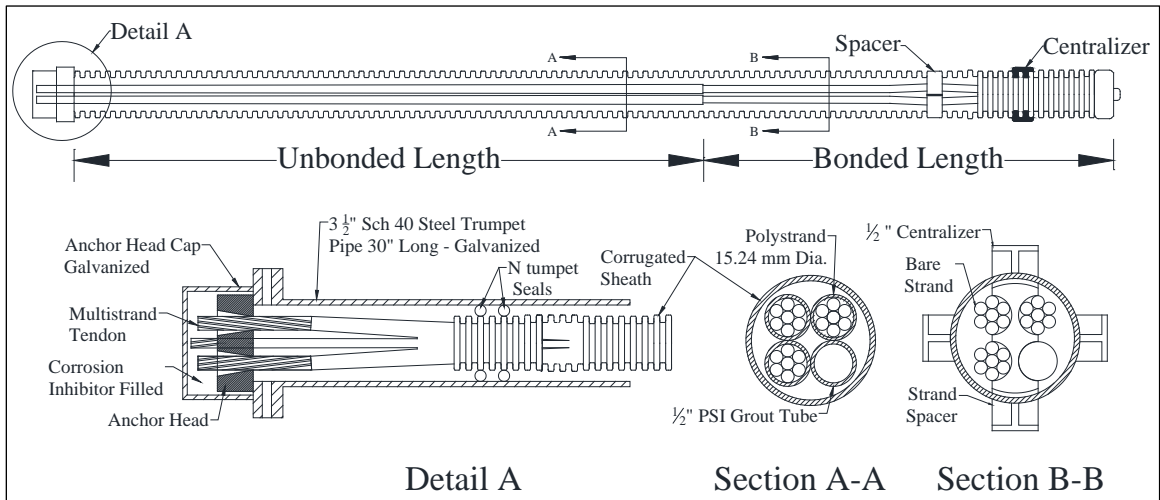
Typical Anchor Installed in the Upper Wall.
